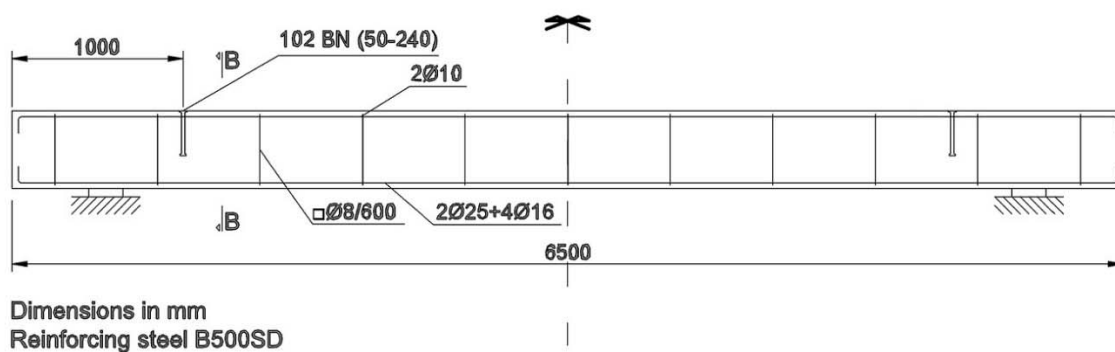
Geometry and reinforcement layout for shear behaviour test beams
